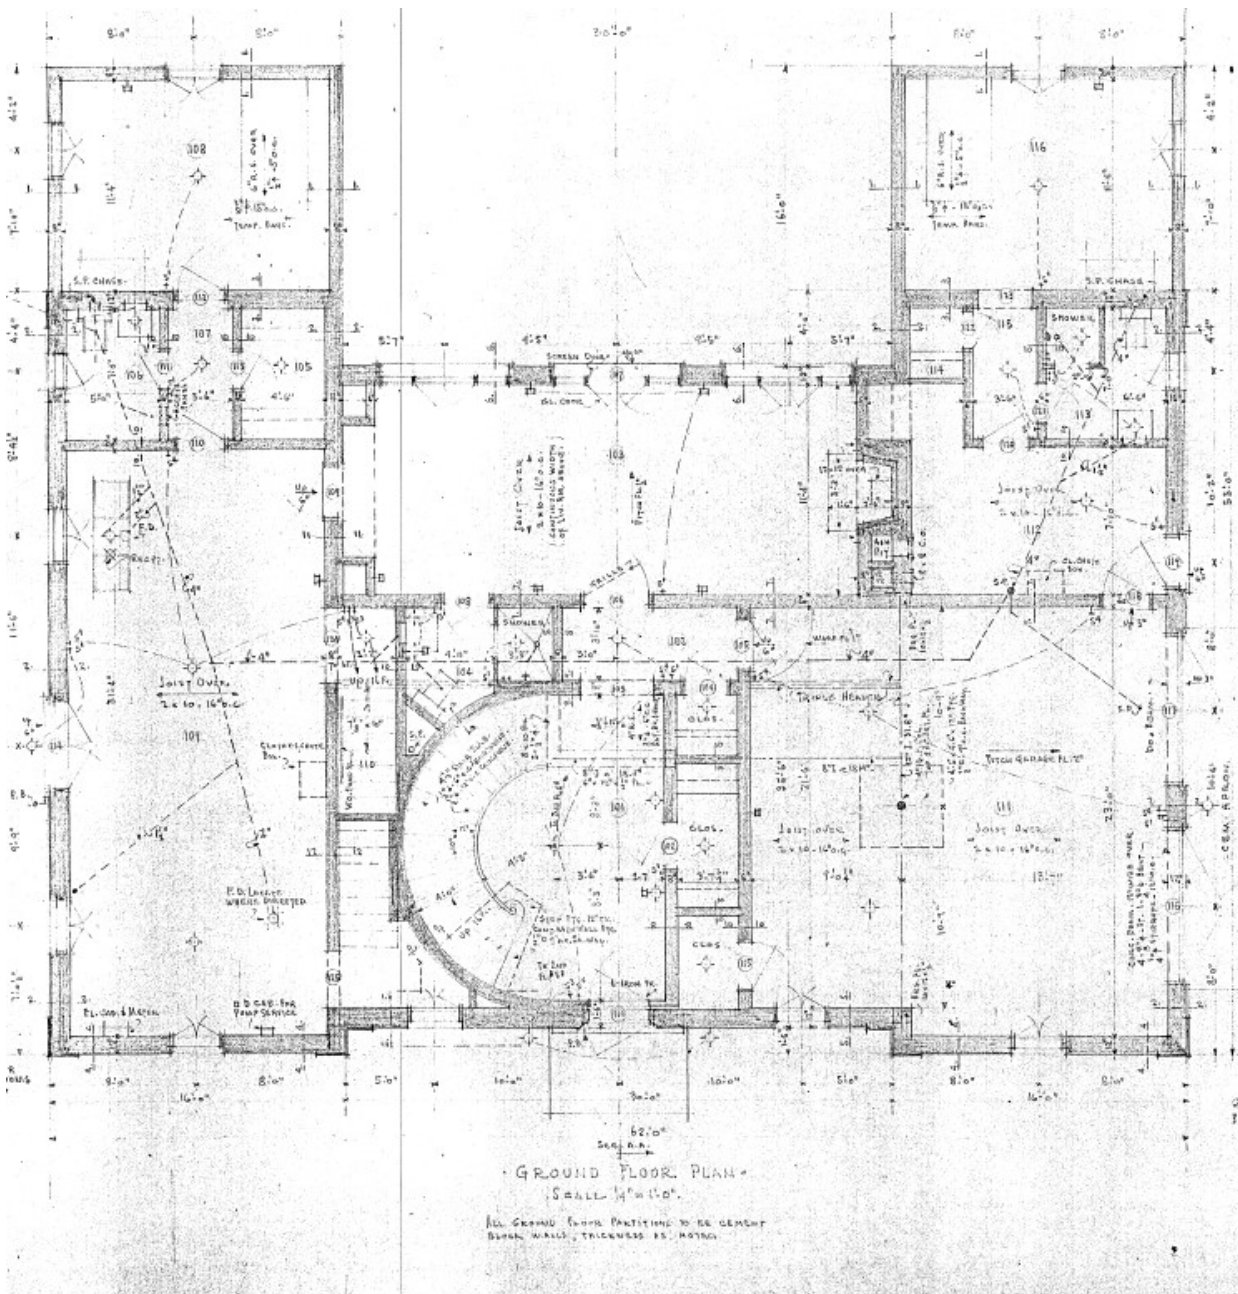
Original 1937 plan of the ground floor of the Charles E. Leigh Home.
